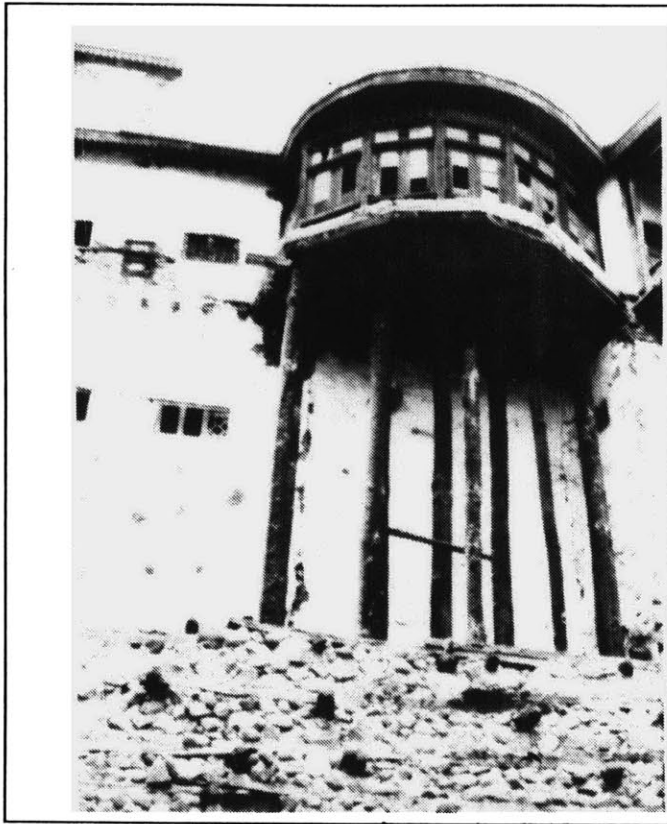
Bay projecting from the southern facade of the fort and is believed to be apart of later additions.
